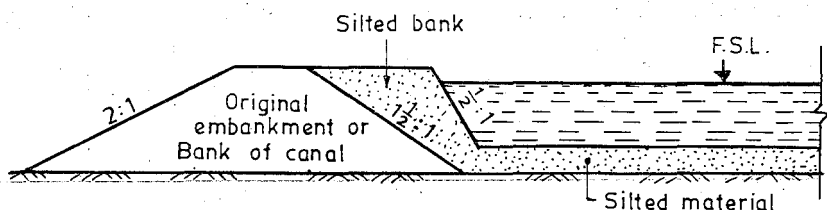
Internal silting method for widening canal banks in canals constructed in filling.
